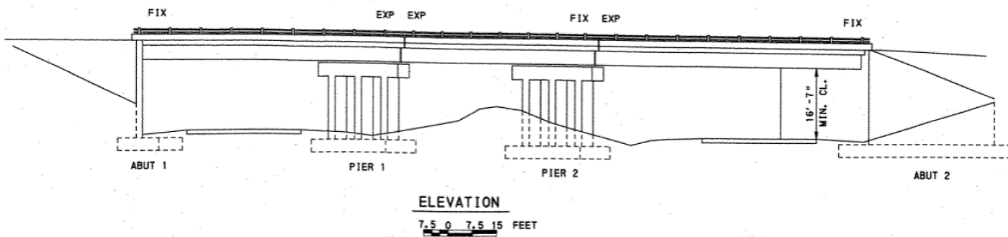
As-Built Plan (Elevation View) Bridge No. 22383
